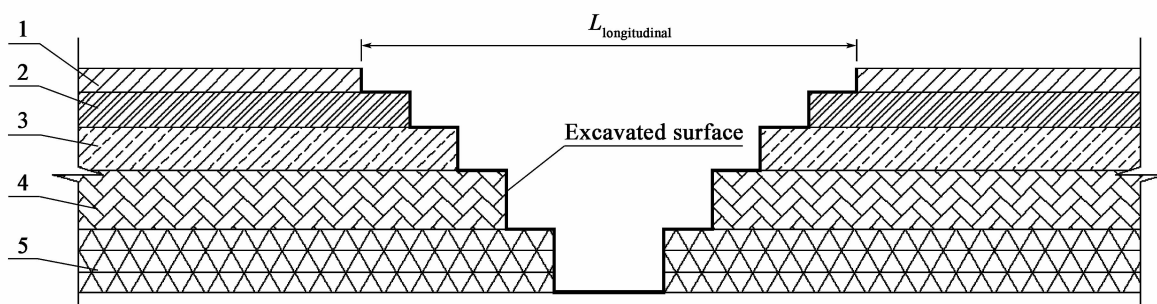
The schematic diagram of cross section (Note: 1, 2, 3, 4, 5 refer to each structural layer of pavement)
